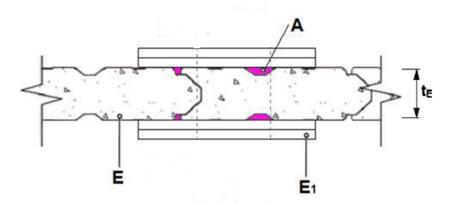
Aperture framing / beading and position of the seal in walls / floors
